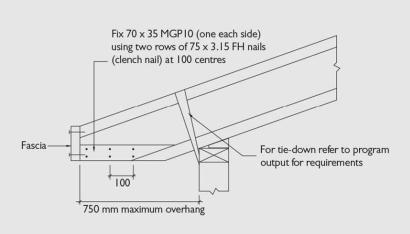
Rafter overhang - sloping soffit with bevelled plate supports
